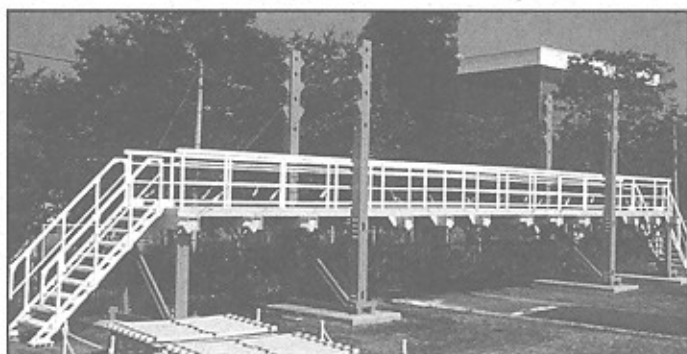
FRP Continuous Cable-Stayed Bridge, Japan
